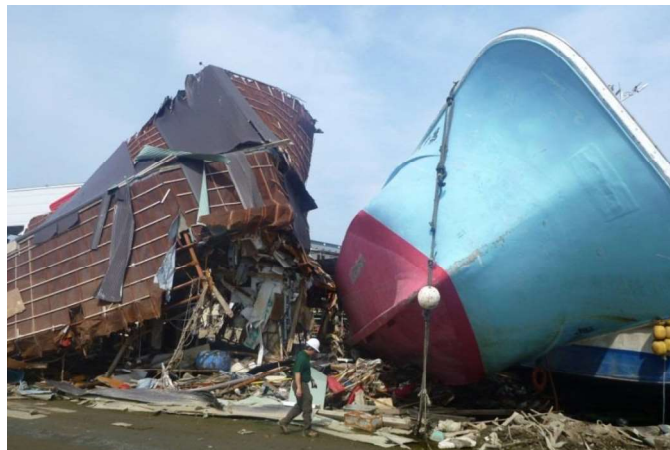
Building Damage Due to Tsunami Inundation
